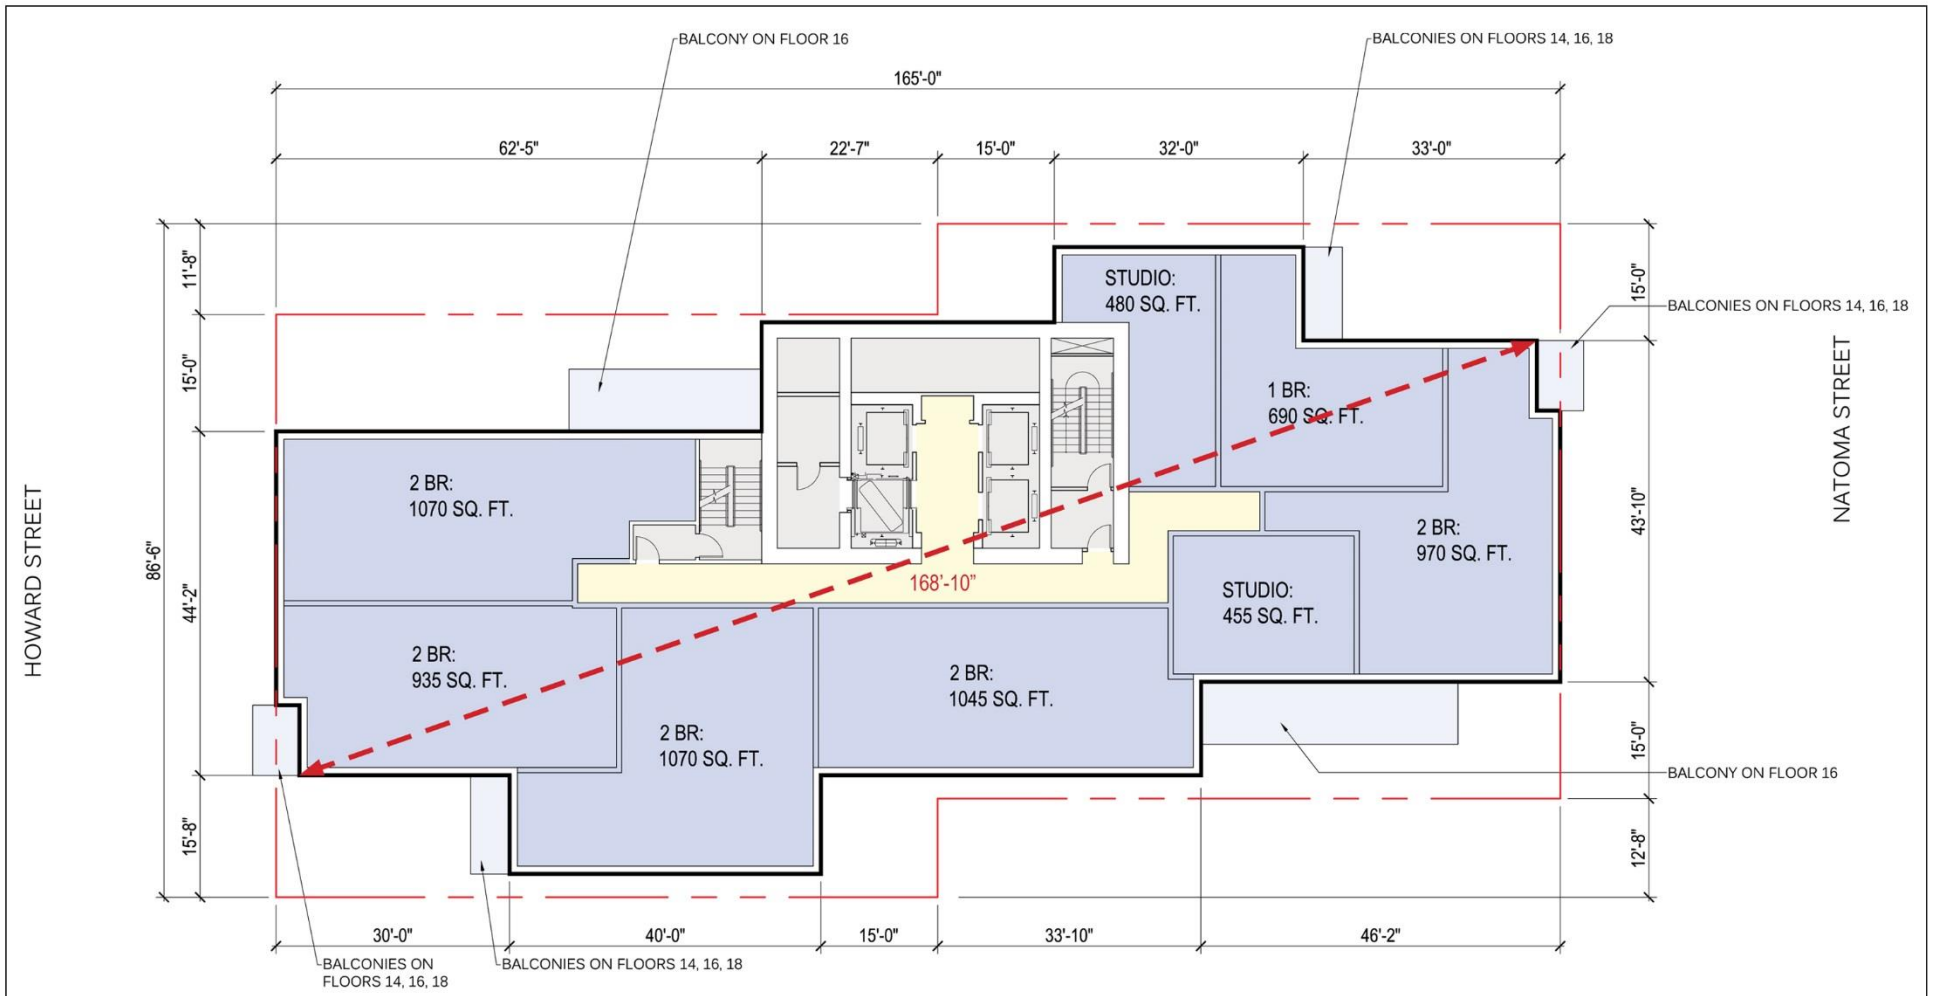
Conceptual Residential Floor Plan (Floor 8)
